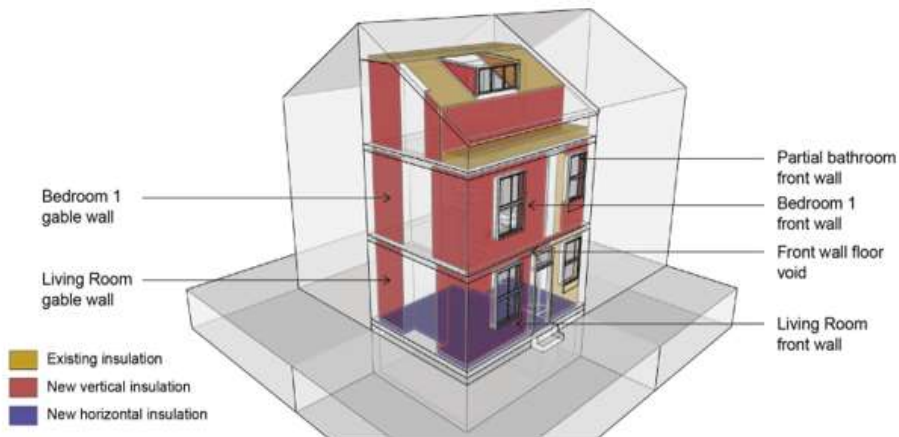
Stage 4: IWI retrofit to ground and first floor external walls (17BG.A.R.F.W)
